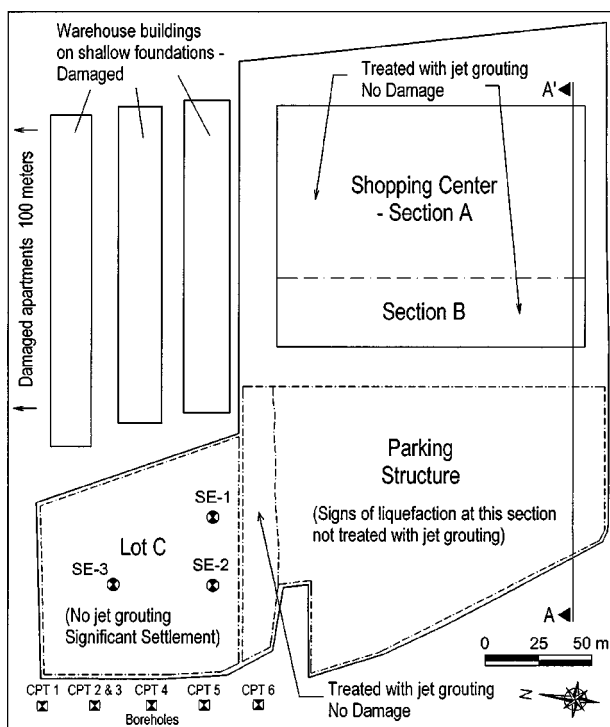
Site plan of Carrefour Shopping Center showing improved area and unimproved areas along with observed earthquake damages. Locations of post-earthquake soil investigations are also indicated.
